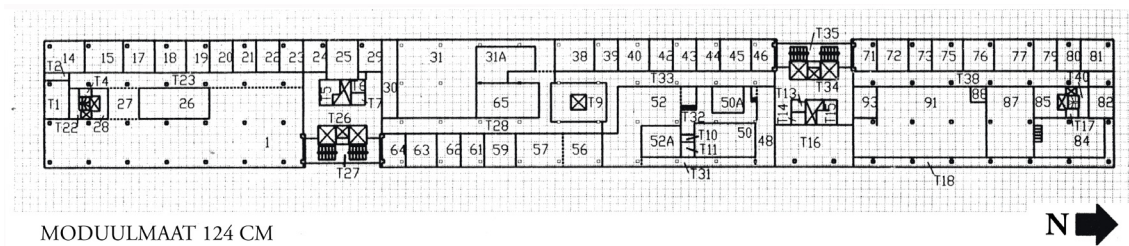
As-built Floor Plan of 10<sup>th</sup> Floor Case Rooms
